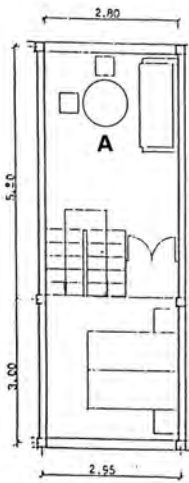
COLLECTIVE HOUSE, LITVÍNŮV, THREE-ROOM, TWO-STORY UNIT PLAN.
